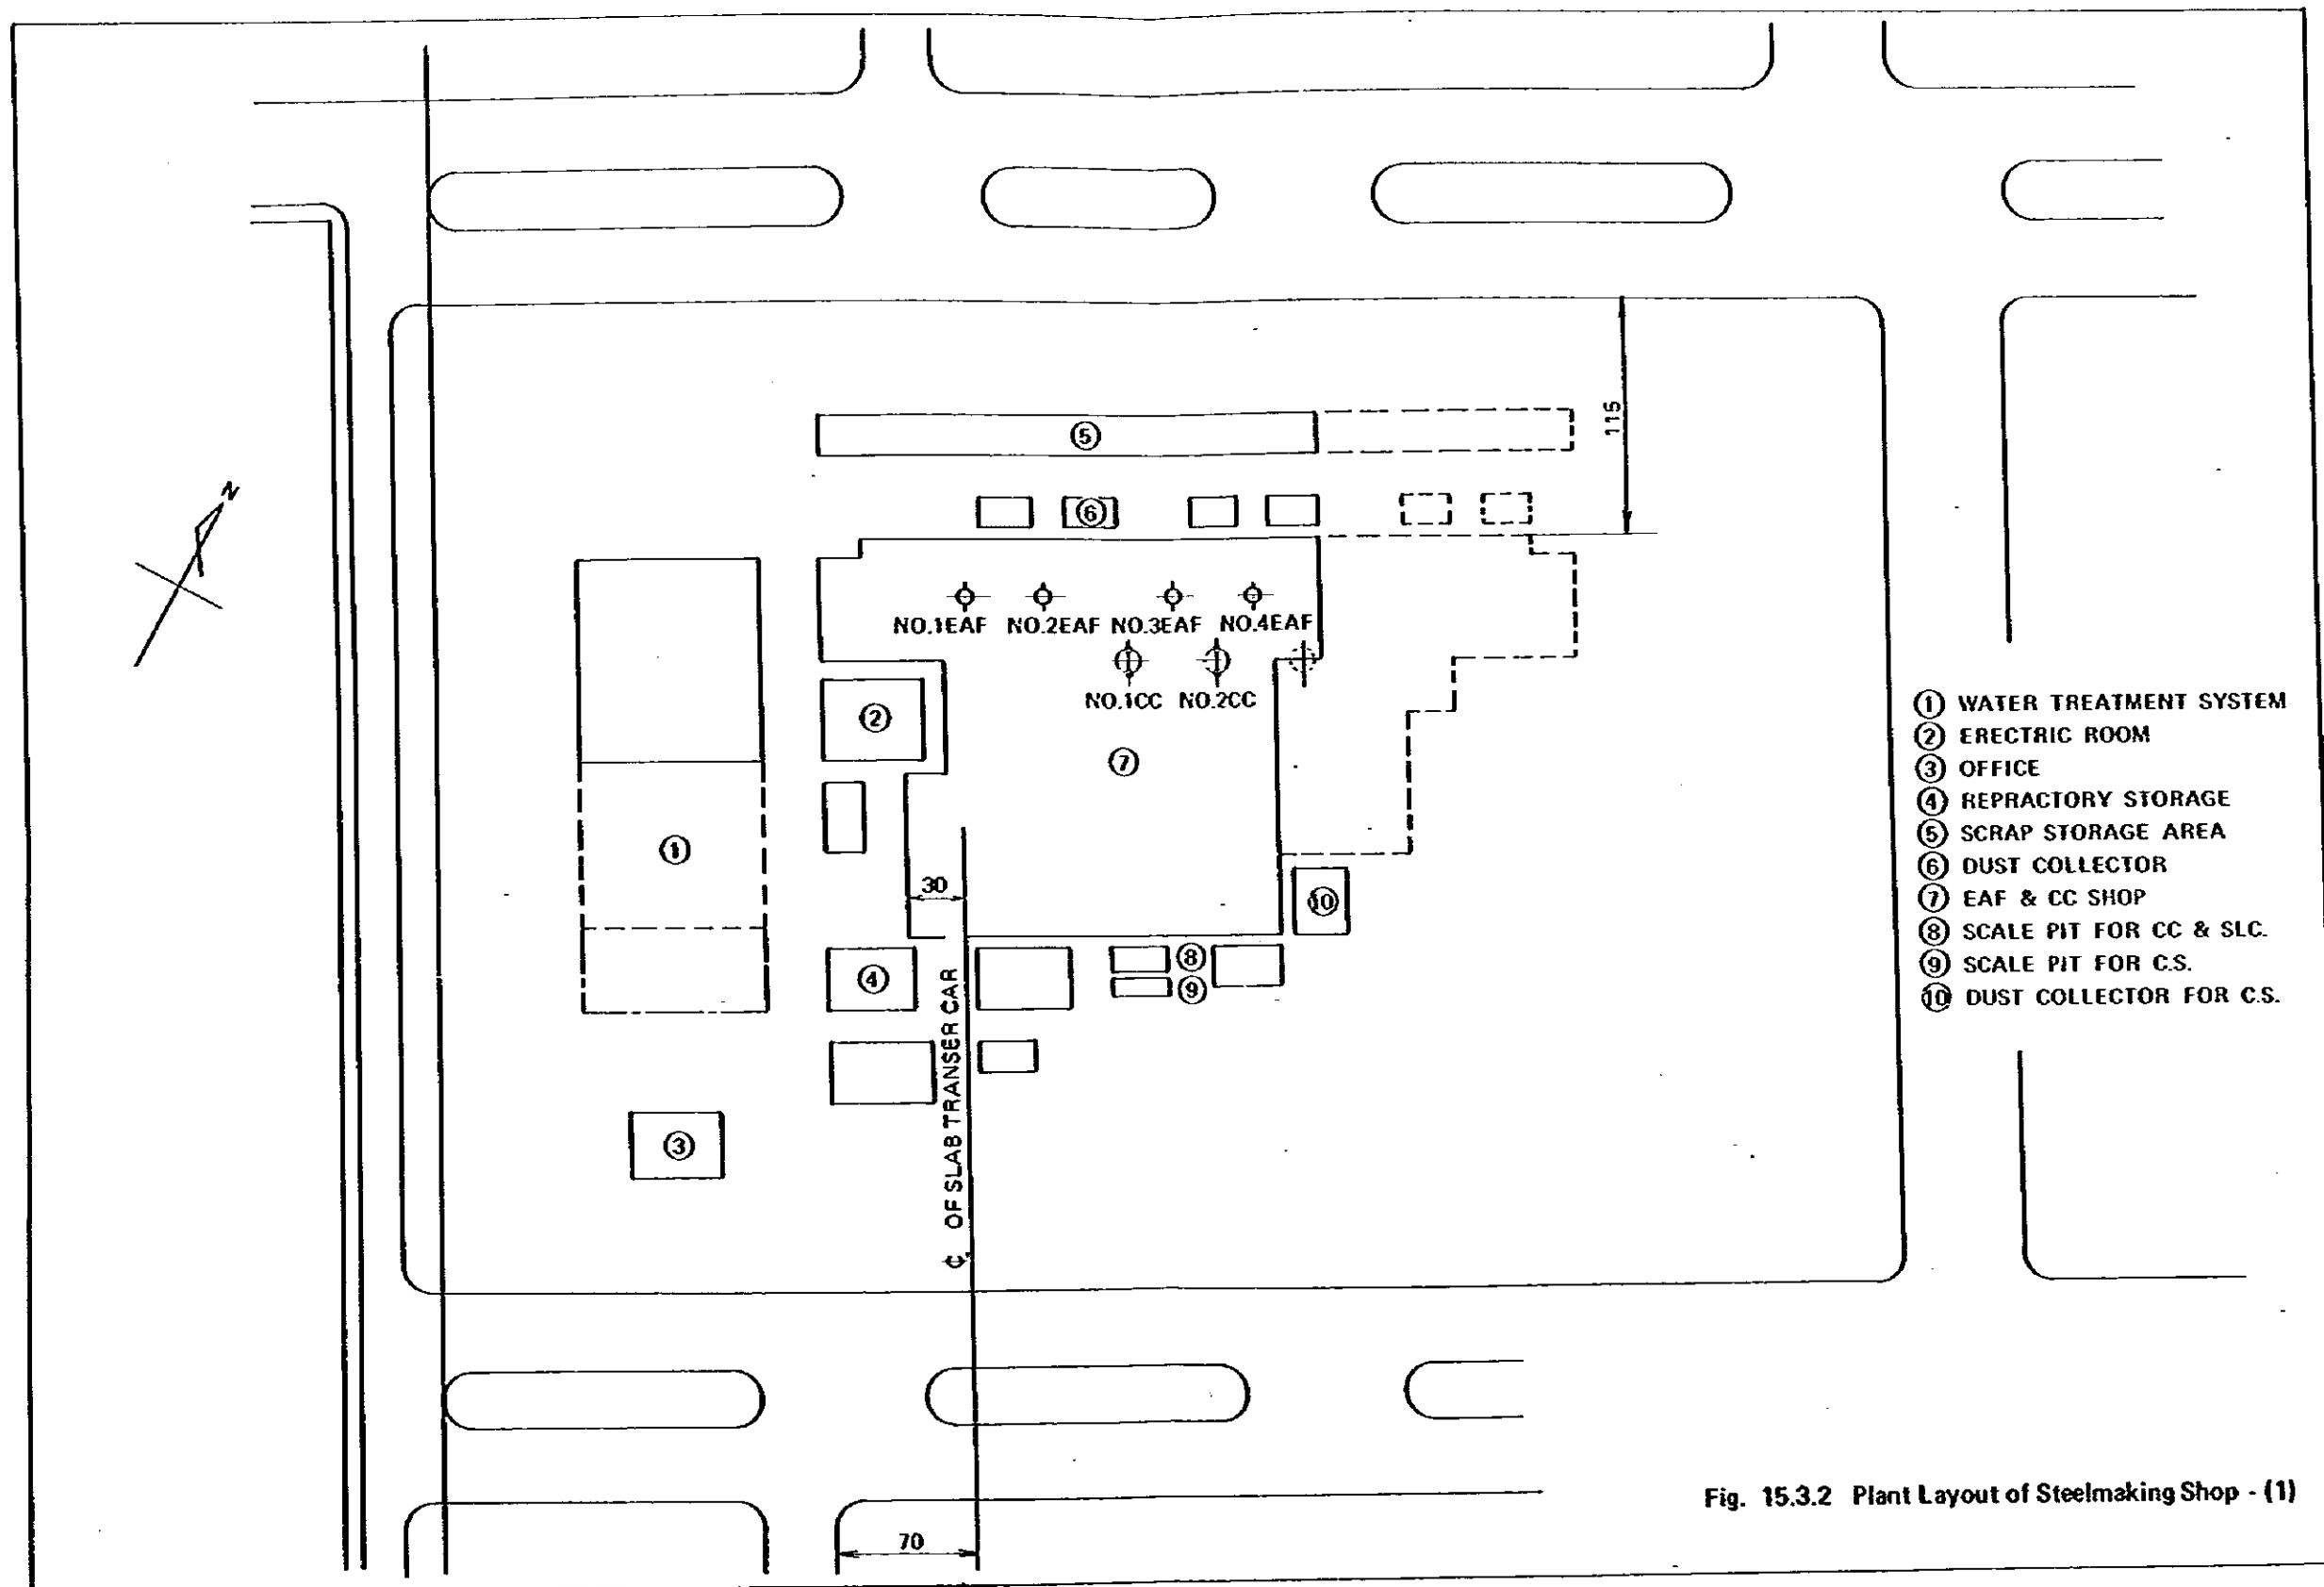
Plant Layout of Steelmaking Shop - (1)
